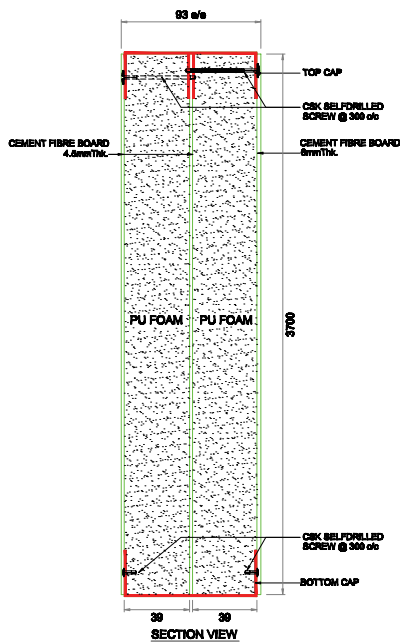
A: 93mm Panel Plan & Elevation Section View
